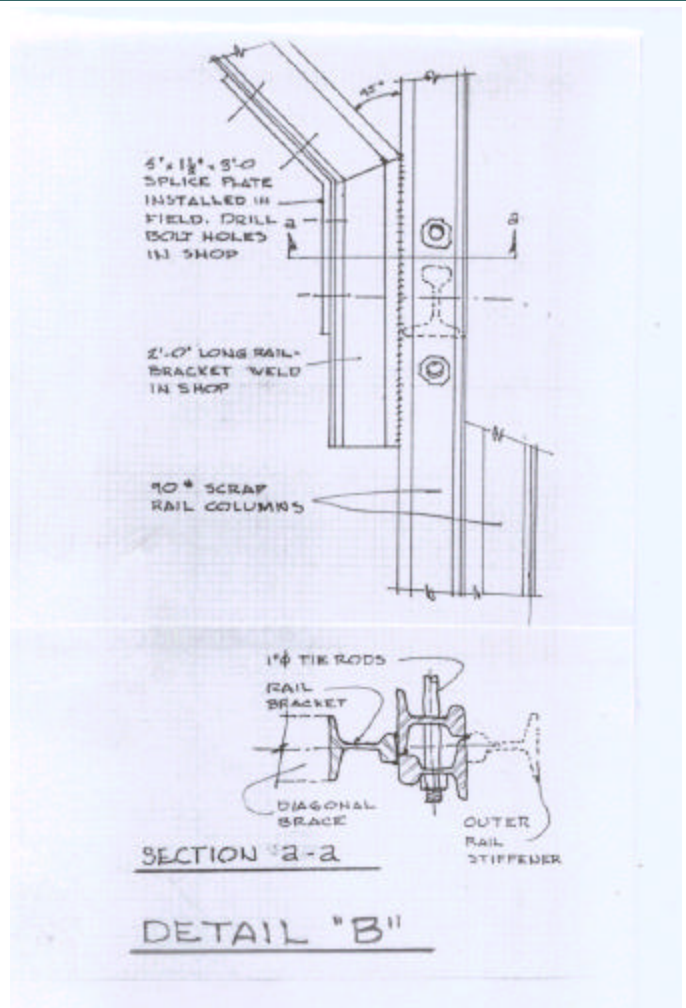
B: Construction details of the sand tower. Not the reuse of 90# rail welded head to toe with extra stiffeners.
